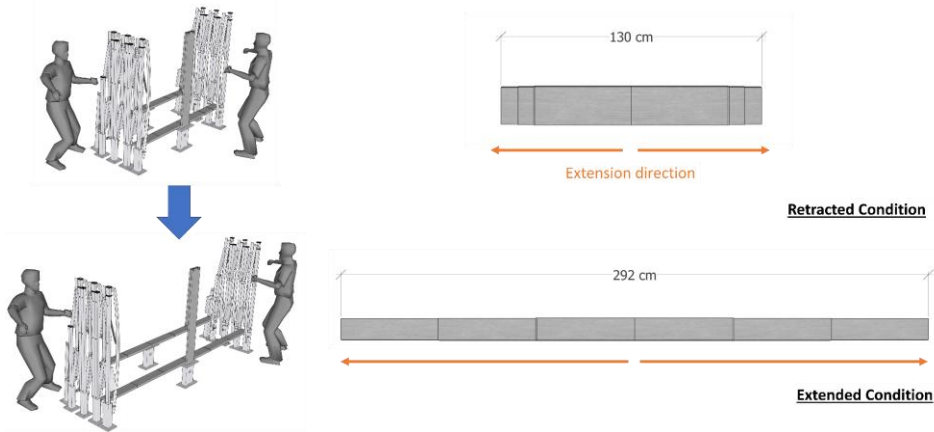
Retractable Construction that can be Compressed and Stretched
